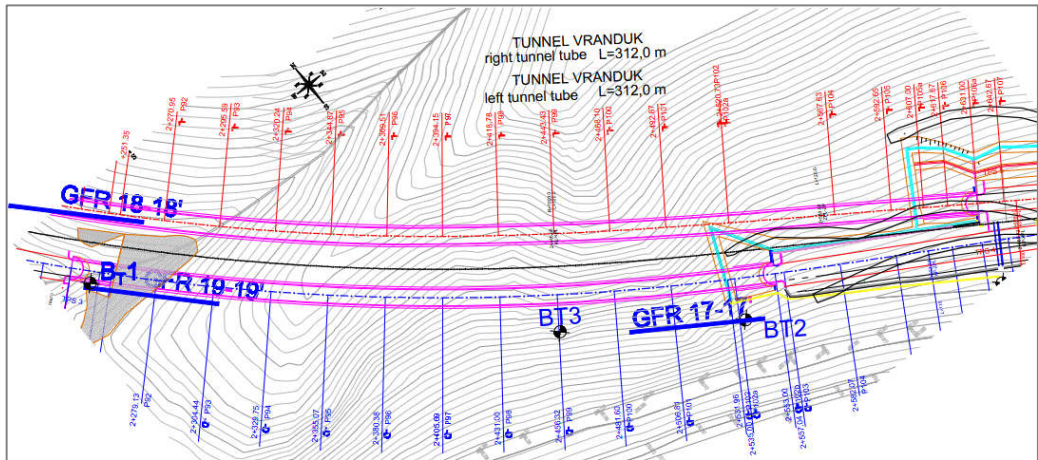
Arrangement of test profiles in the Vranduk Tunnel excavation zone
